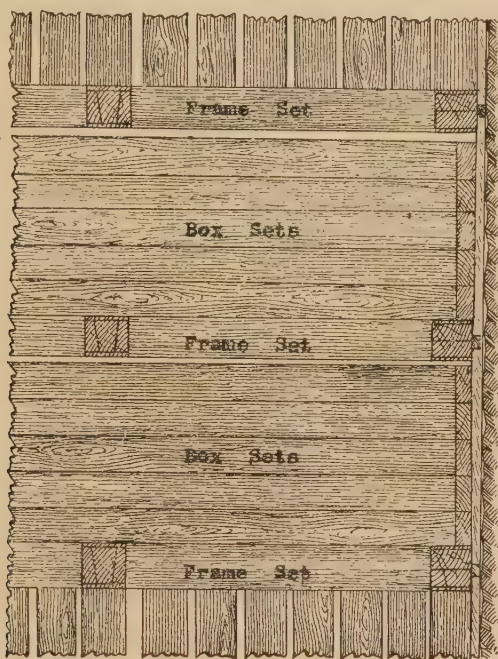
Reinforcing damaged sets in frame-set shaft.
